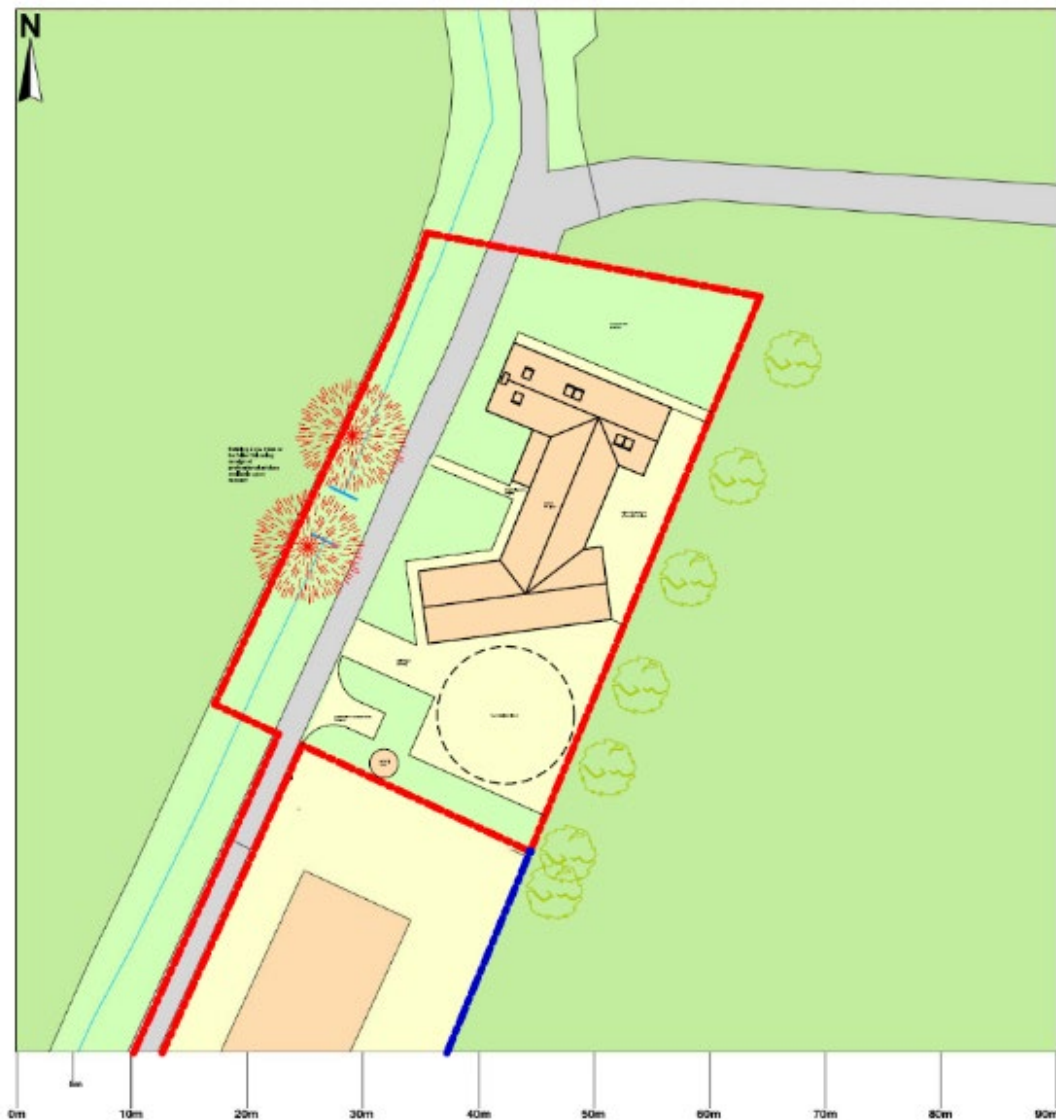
Approved site plan for new dwelling adjacent to the Old Piggery in Blairforge. The proposal was for a new dwelling to land adjacent to the applicant's existing dwelling for them to move into. The applicant's existing dwelling can be seen SW of the proposed dwelling in the above site plan
